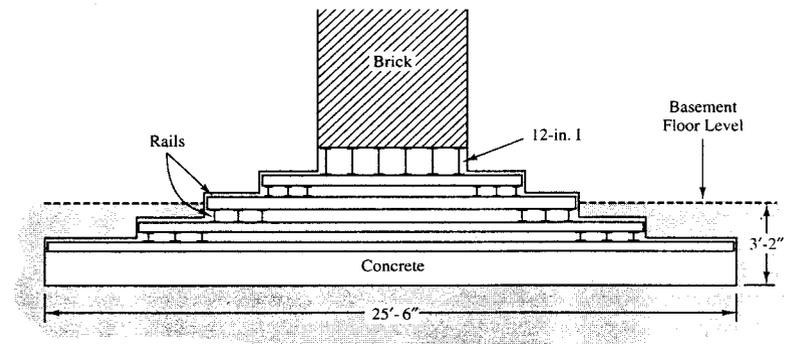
Steel grillage footing made from railroad tracks, Montauk Block Building, Chicago, 1882. The concrete that surrounded the steel was for corrosion protection only (Peck, 1948).
